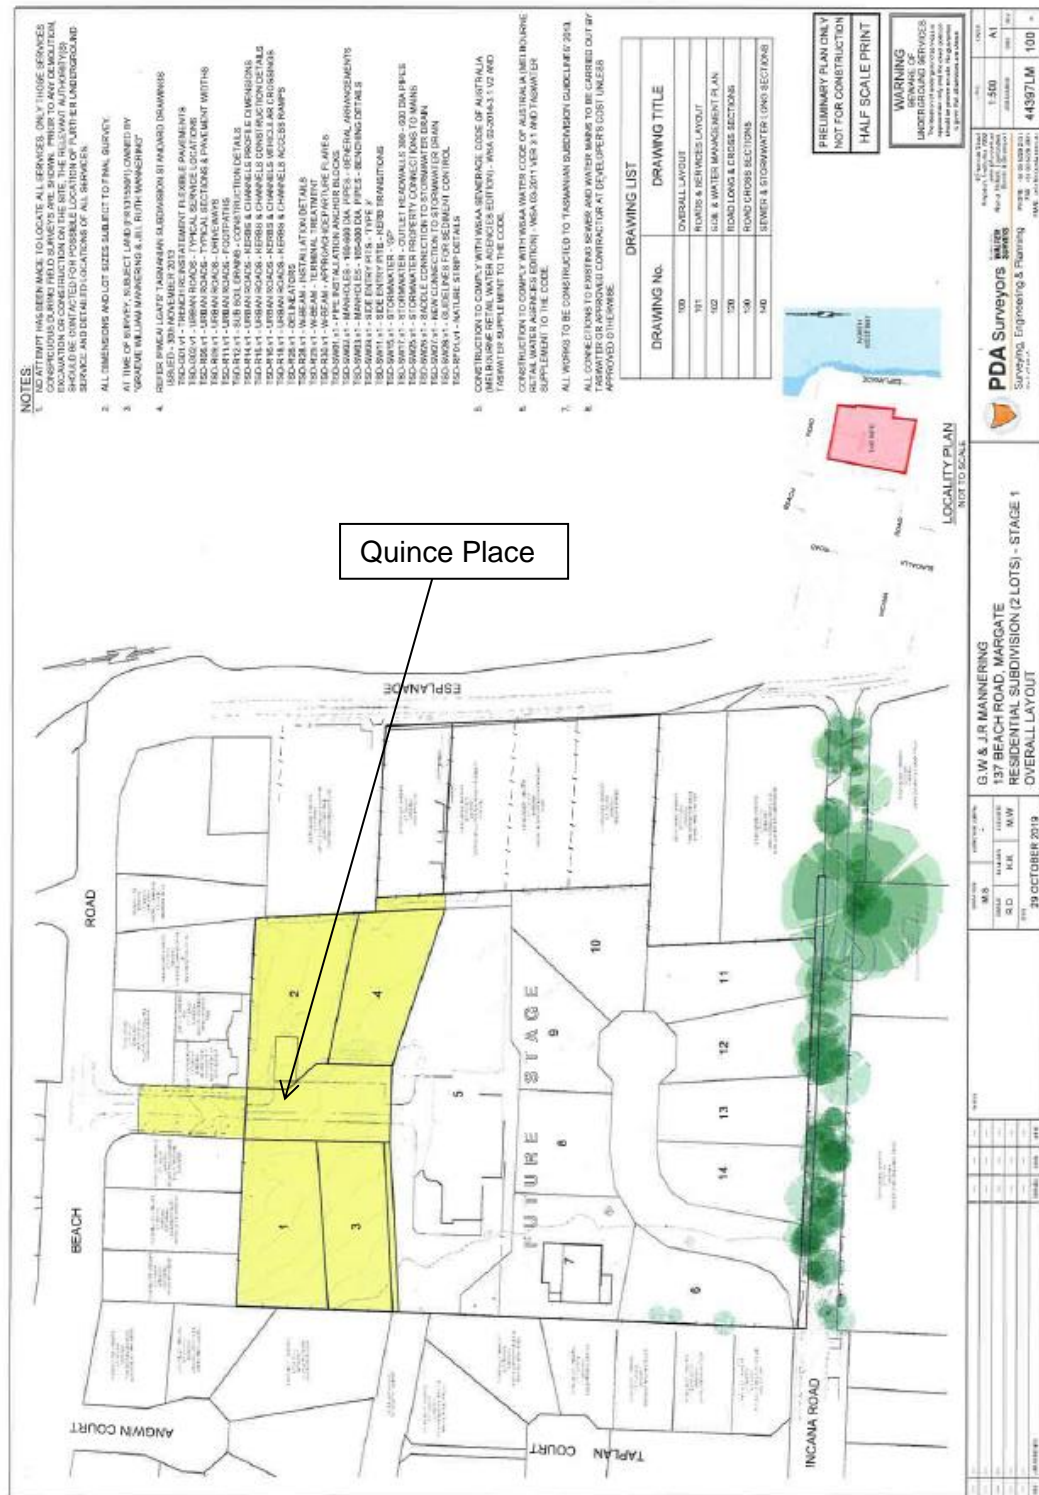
DAS-2018-25 – Stage 1 - Boundary adjustment between three lots and subdivision of 14 residential lots, two road lots and a footway at 137 Beach Road, Margate.
